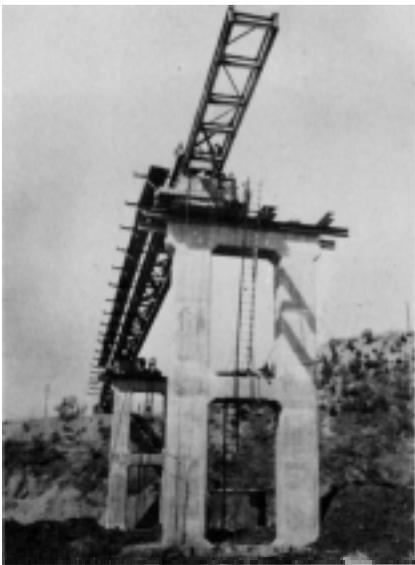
Downstream girder launched from the west abutment across pier 8 to pier 7 on 6 April 1953. The 30-foot launching nose extends beyond pier 7.
